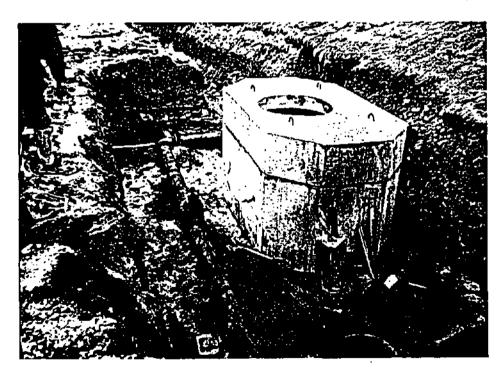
North Bloomfield, N.Y. 1/12/88. A water meter vault and a by-pass system on Ontario Street.
